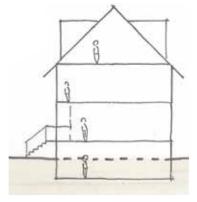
Example of one way to achieve a 2.5 storey infill building with a daylight basement (See policy 8.11.9).
